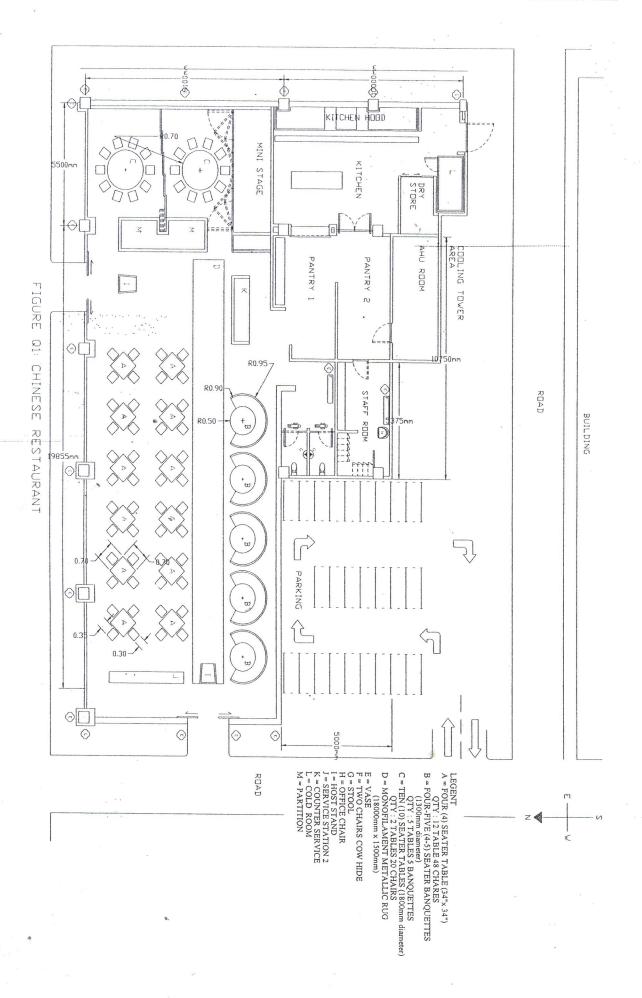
shows a Chinese Restaurant floor layout. There is an air handling unit (AHU) room next to Pantry 2 in the building. The air conditioning system installed for the building shall be the water-cooled package (WCP) system.
